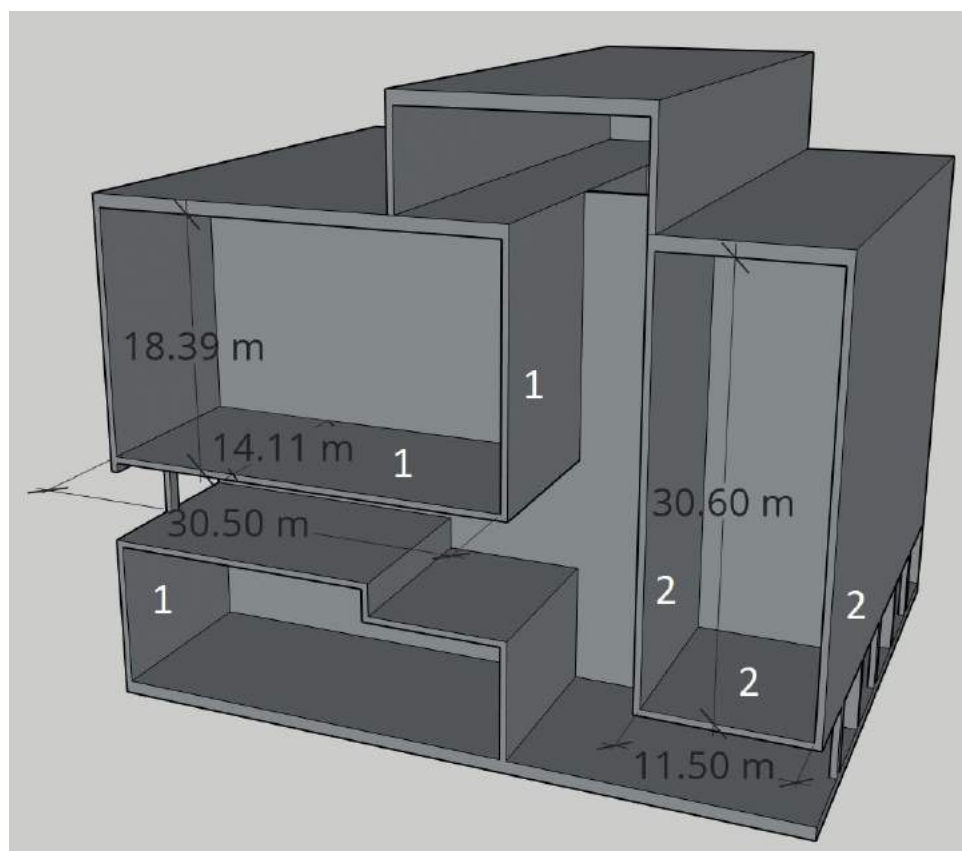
Cross-section, 3D, of the alternative 'Unity'.
